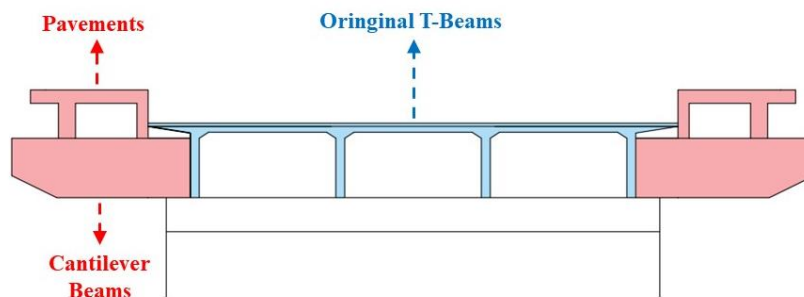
The cross-sectional schematic diagram of addition of reinforced concrete cantilevered beams
